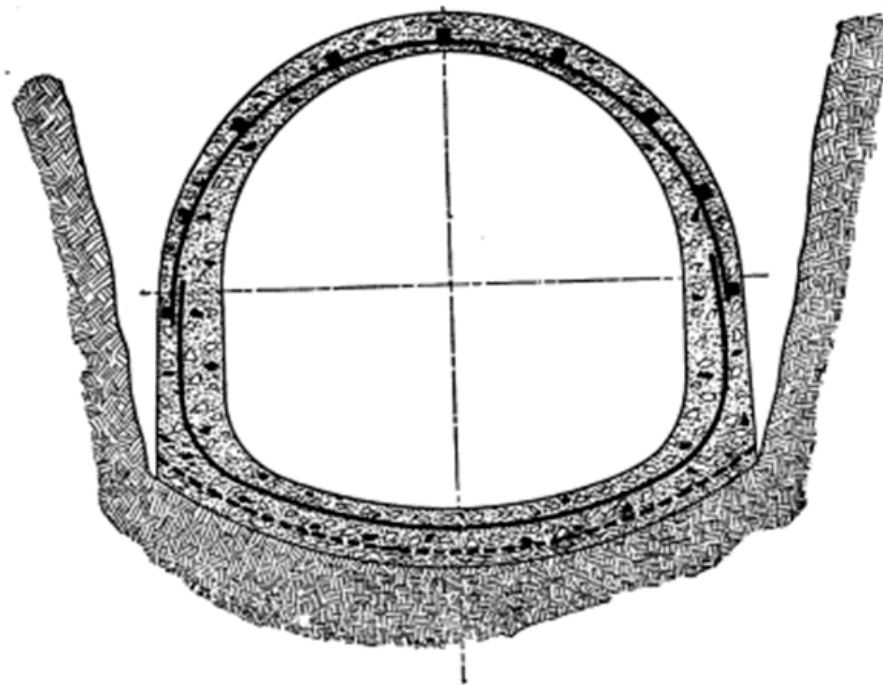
Cross-section of concrete water pipe by the Jersey City Water Supply Company.
